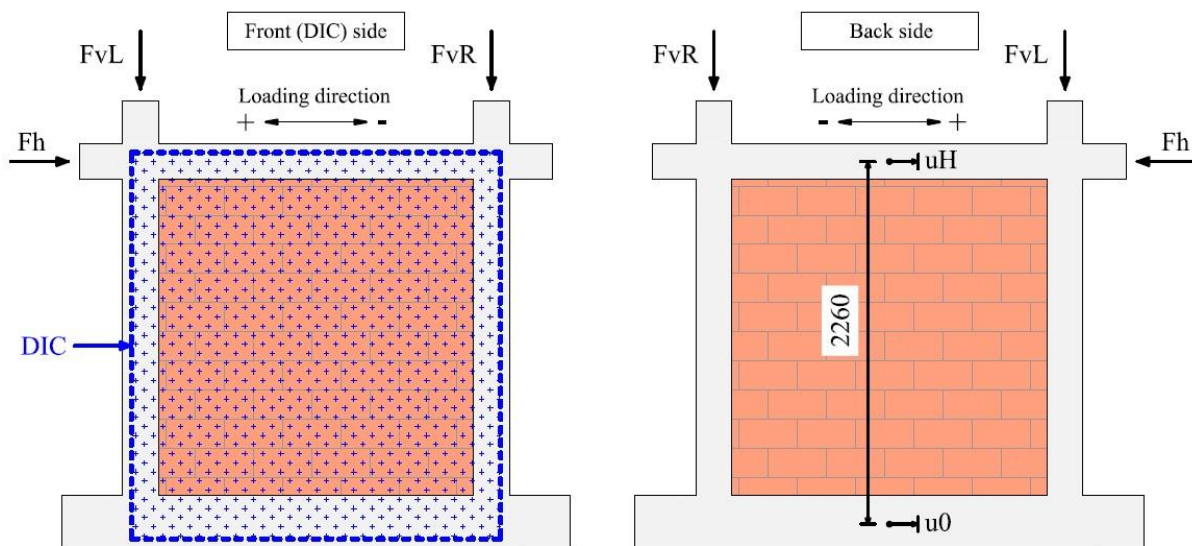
Schematic view of the measurement techniques [dimensions in mm].
